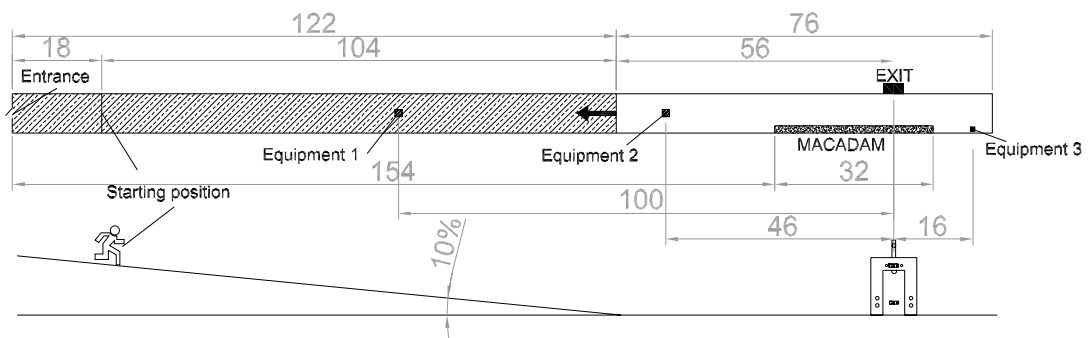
A schematic sketch of the tunnel. The upper part illustrates the above view, and the lower part illustrates the side view of the tunnel geometry. Note that the text EXIT marks a fake emergency exit used in the experiment, and could not be used to exit the tunnel. Measurements in metres. Illustration: Enrico Ronchi.
